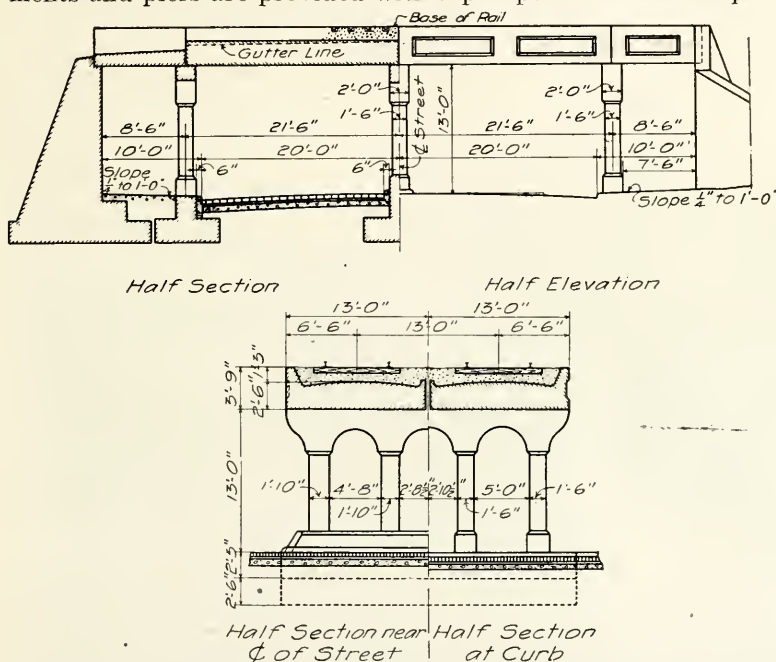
GENERAL ELEVATION AND SECTIONS—CHICAGO AVENUE SUBWAY BRIDGE.
